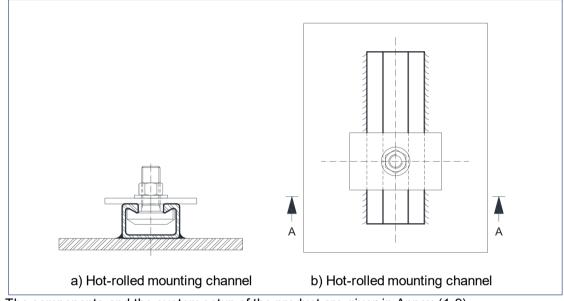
Example of a hot-rolled mounting channels with corresponding channel bolt
